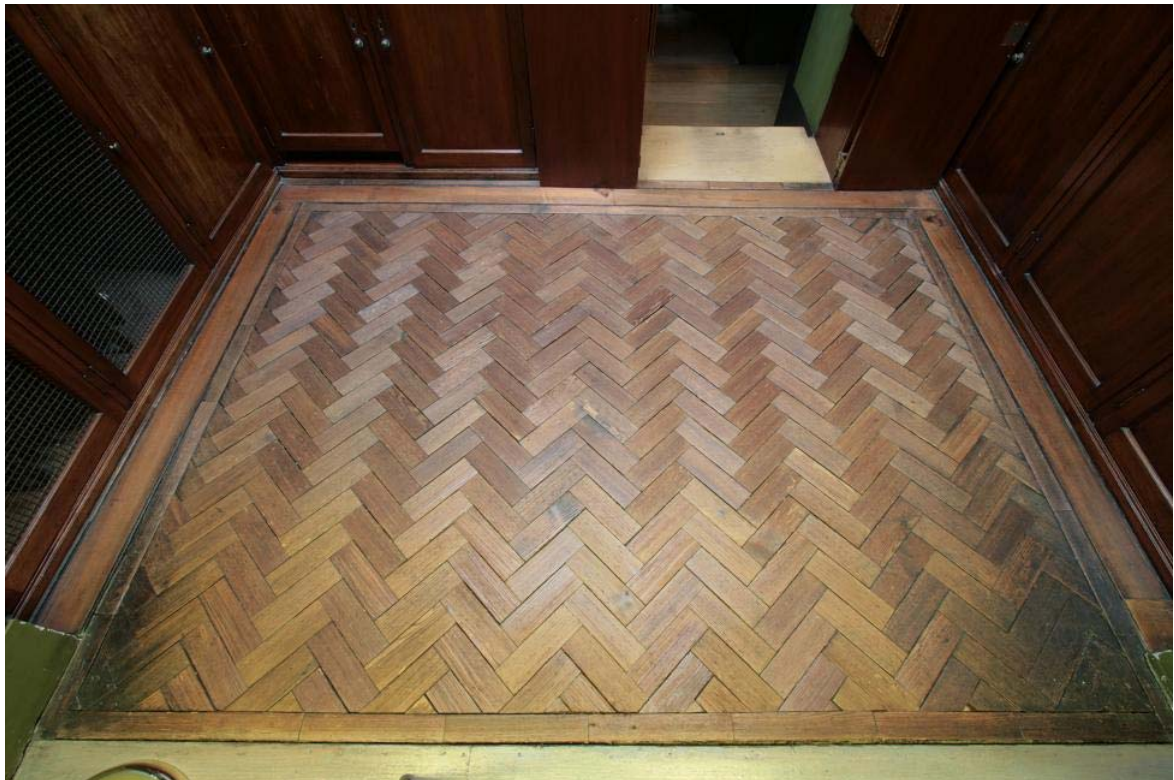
Ground Floor Wild Ante Room Parquet floor, view from the north (PCA)
